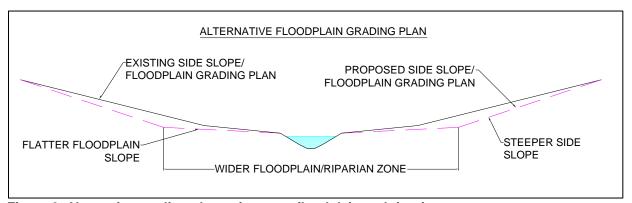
Alternative grading plan to increase floodplain and riparian areas.
